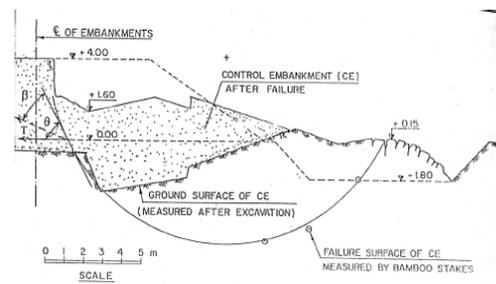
Cross section of Failed Embankment showing Obliquity of Reinforcement Force (after Bergado et al. 2000)
